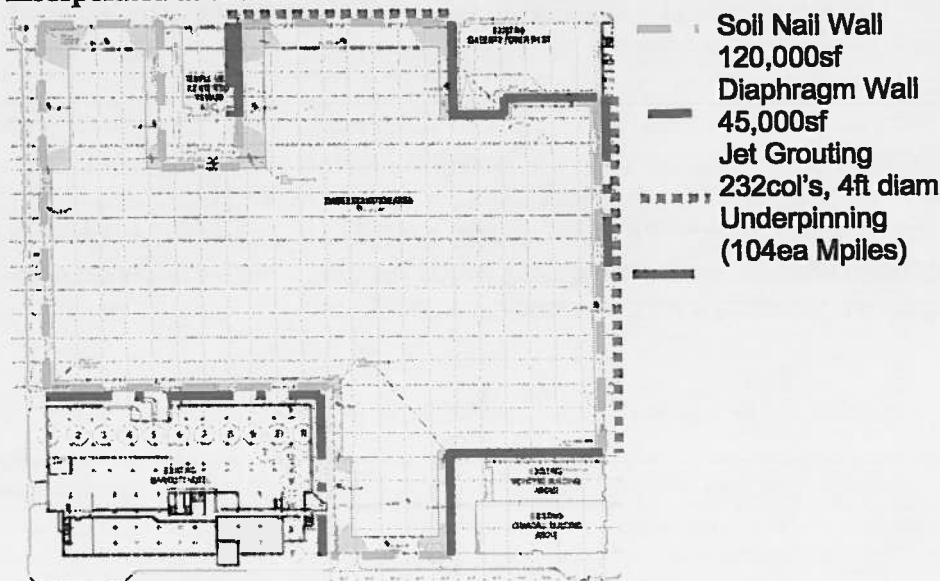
Block 76 Earth Retention Systems Location Plan
